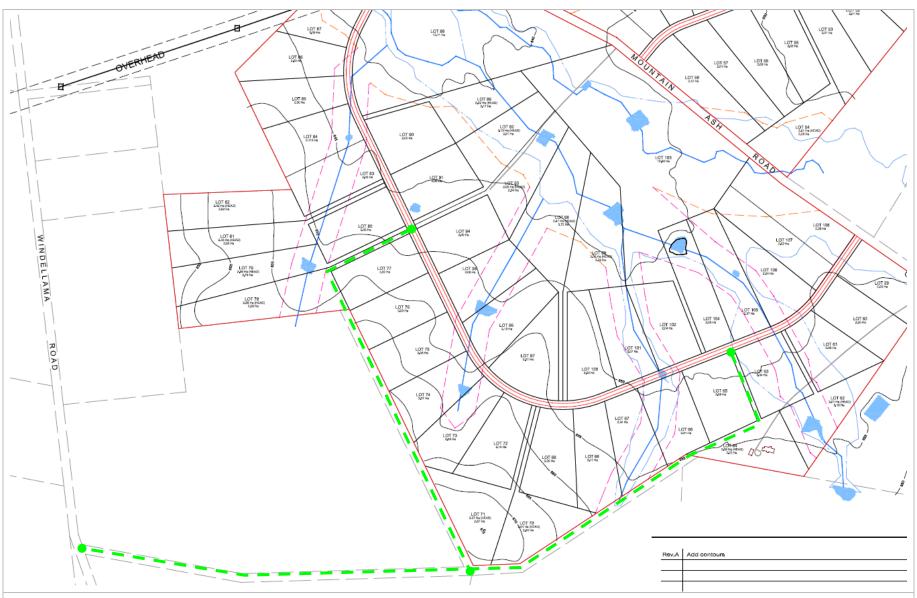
Precinct 3 – Provision for emergency access from Windellama Road via Unnamed Road reserves onto Lots 64 and 78 out to the proposed internal road system.
